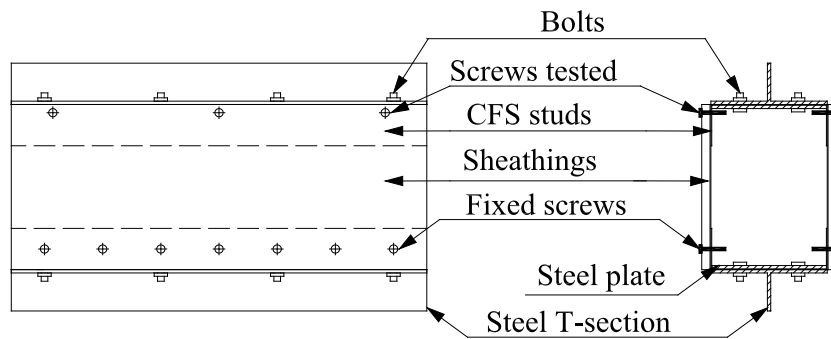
Test setup of connections achieving shear in screws perpendicular to edge
